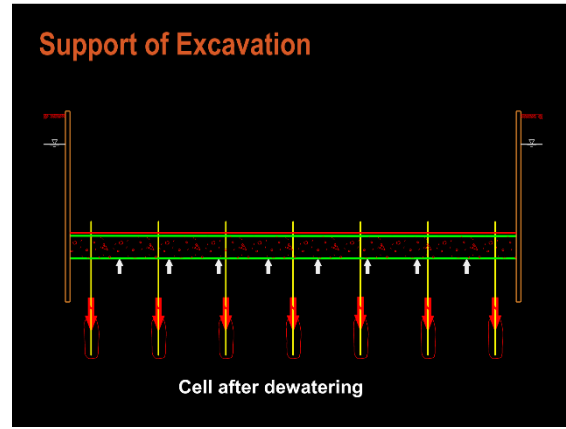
SOE Construction Okeechobee Road depressed section (tie down)
